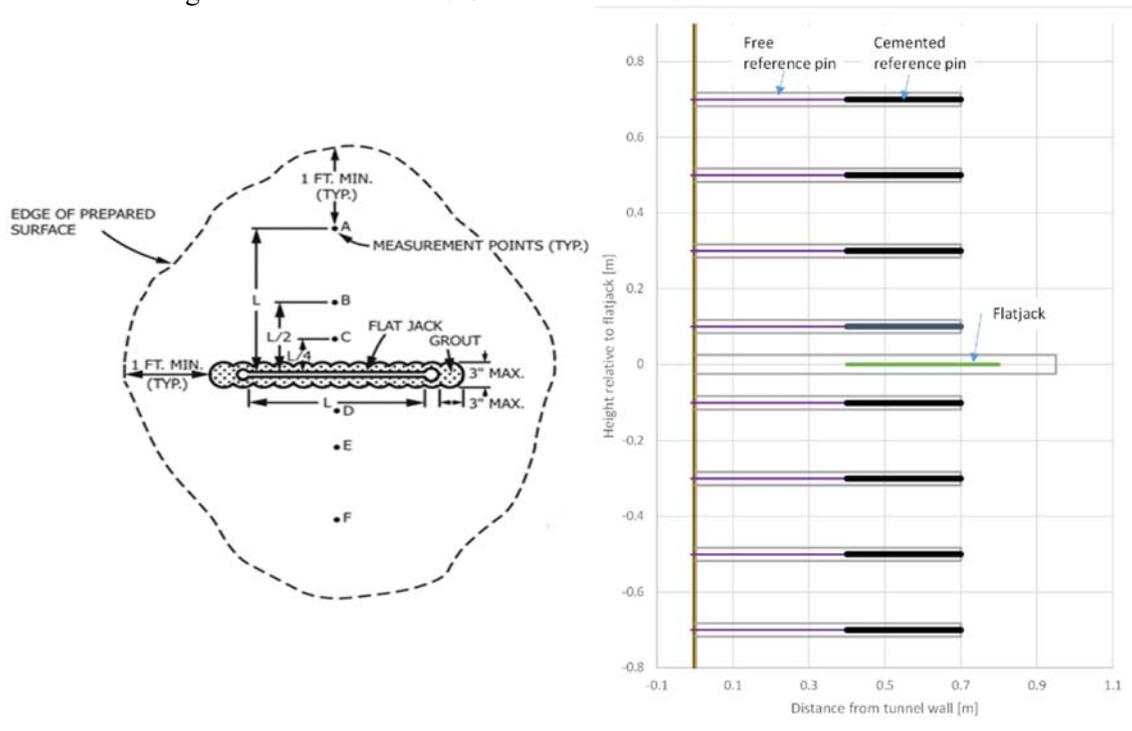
Flatjack array (left) according to ASTM (2008) and modified vertical section of the tunnel wall showing location of flatjack and measurement pins installed in a shotcrete lined tunnel (right).
